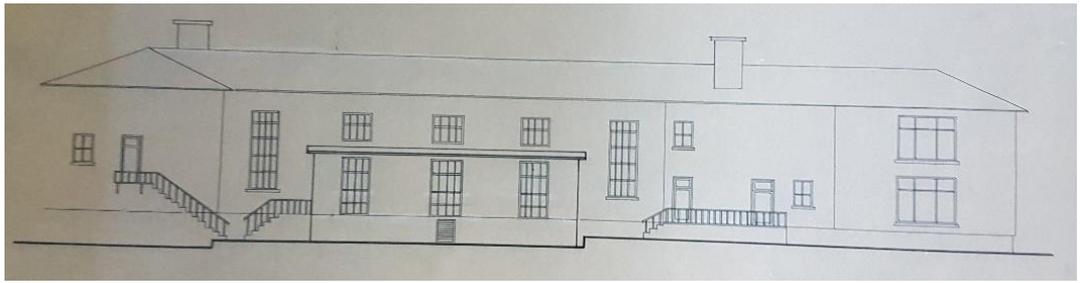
The elevation drawing of the extension proposal of the cinema building (Source: TTK Archive, 2020)
